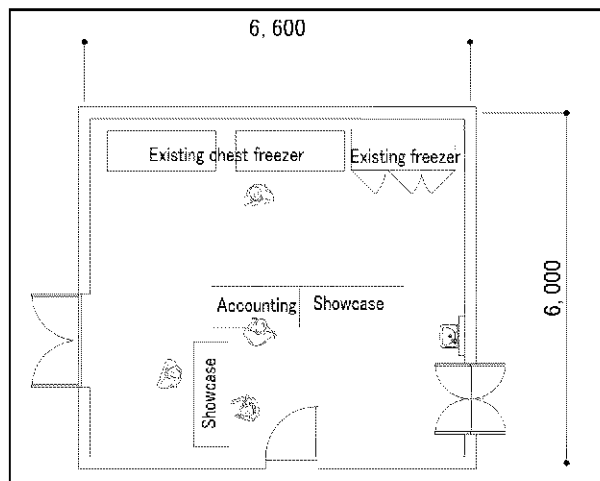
(19) Layout for Processed Fish Sales Booth
